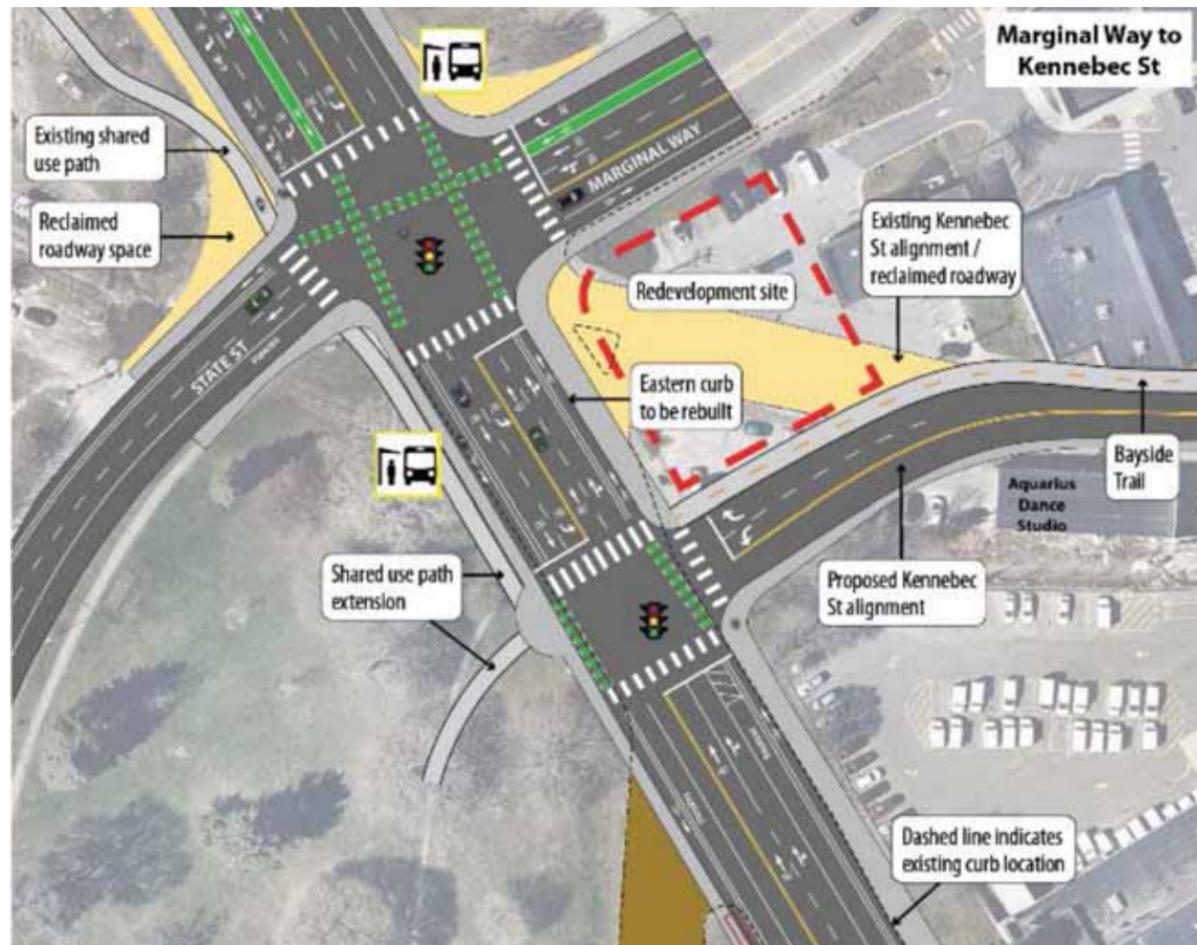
Marginal Way/Forest Avenue/Kennebec Street Intersection
